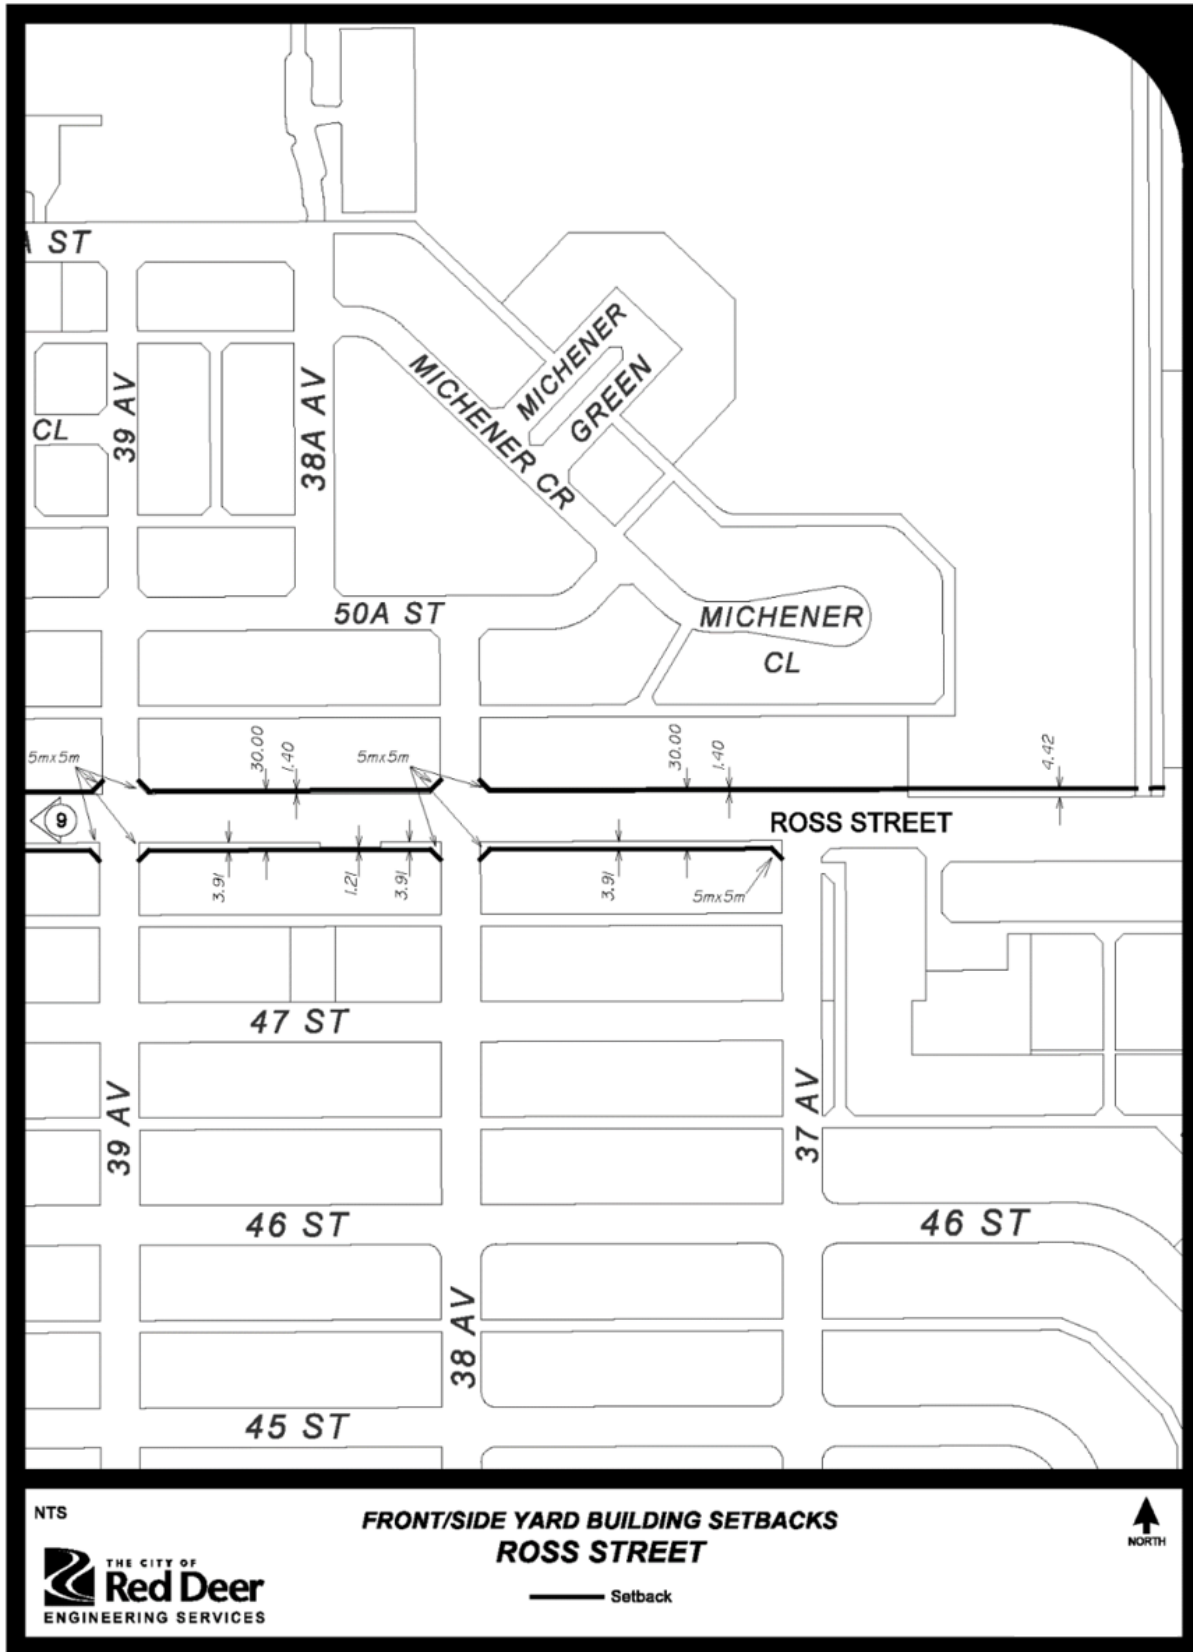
Front and Side Yard Building Setbacks - Ross St (3)
